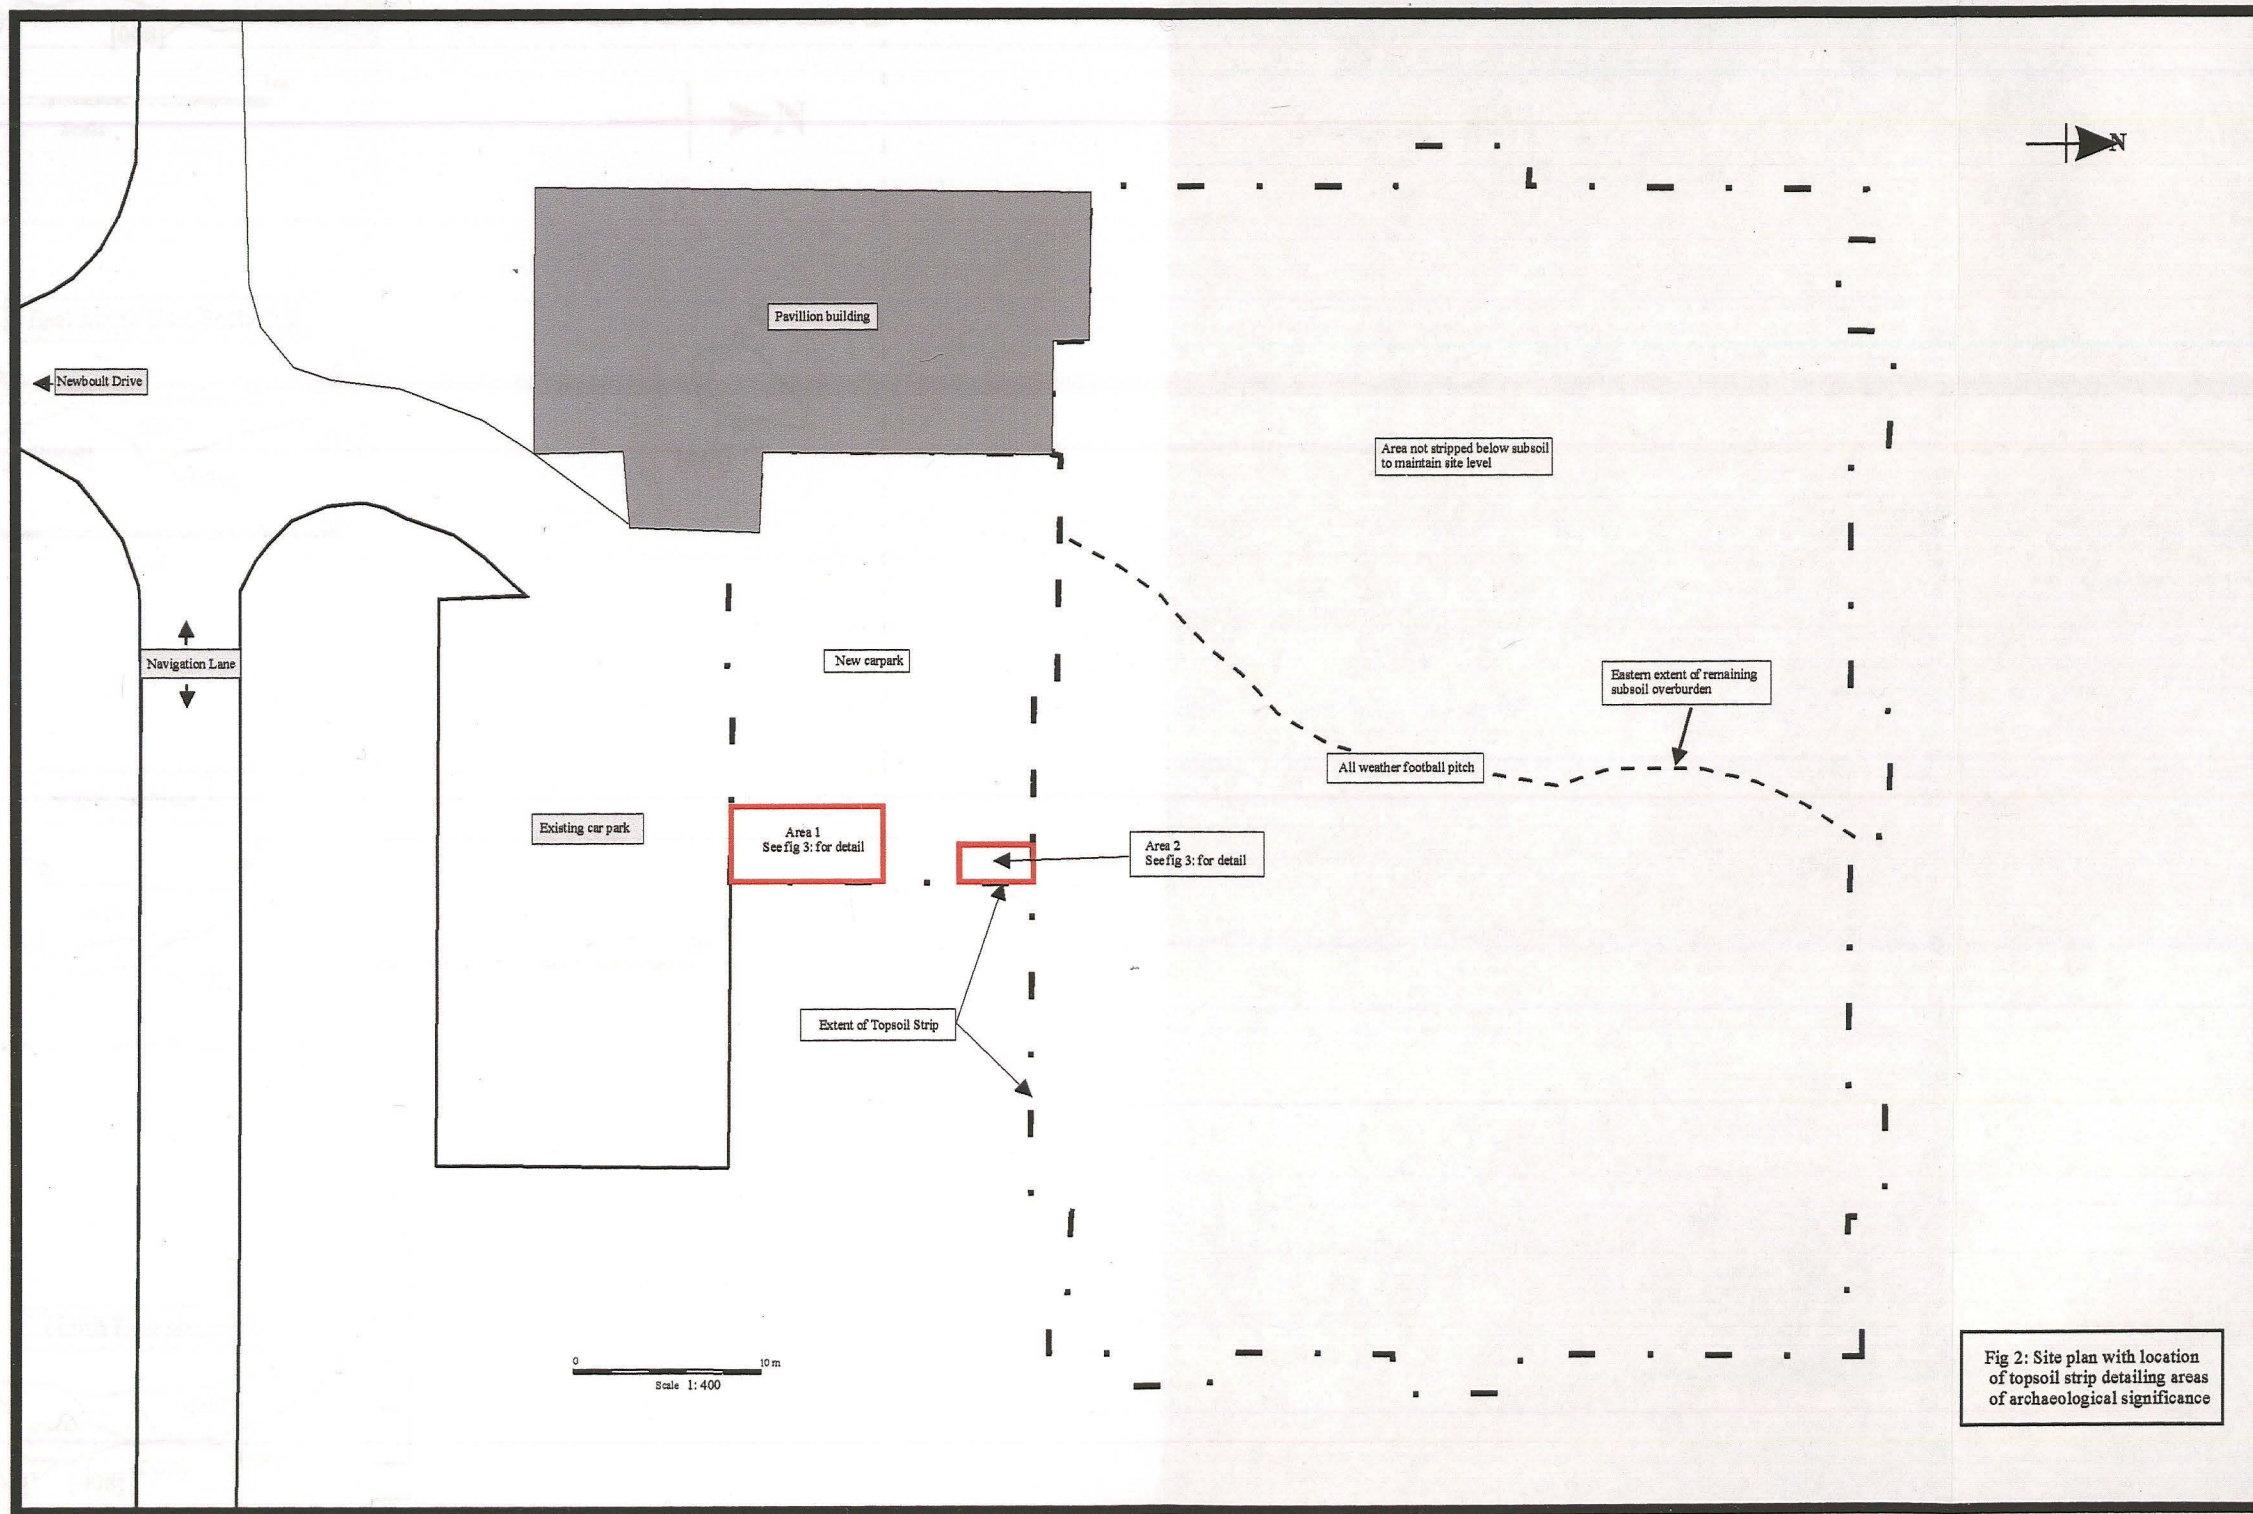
Site plan with location of topsoil strip detailing areas of archaeological significance
